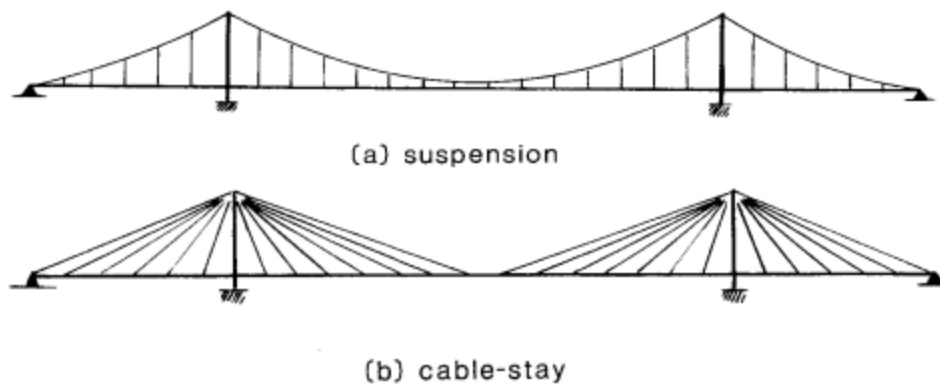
Cable suspended bridge systems, (a) suspension and (b) cable-stayed (reprinted with permission from Podolny and Scalzi).
